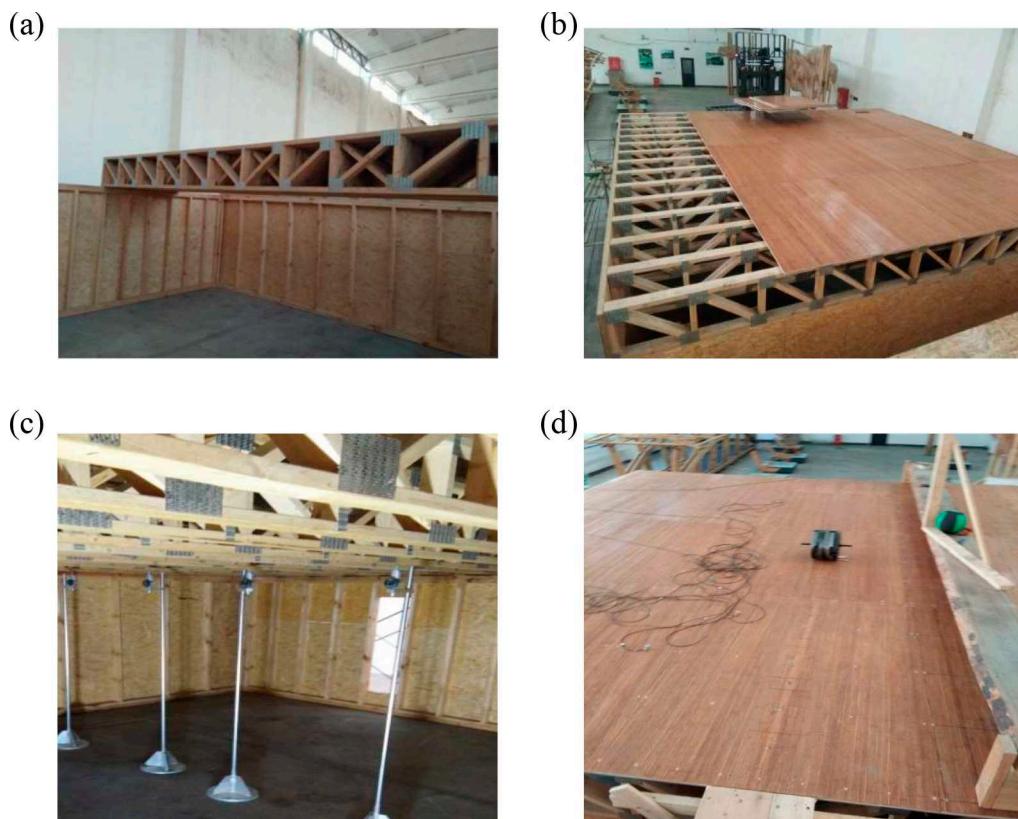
Construction and site layout of the test floor slab vibration test platform. (a) Construction of the vibration test platform of the floor slab. (b) Laying and fixing of the BLVL composite. (c) Micrometer displacement meter arrangement. (d) 1 kN static deflection test setup.
